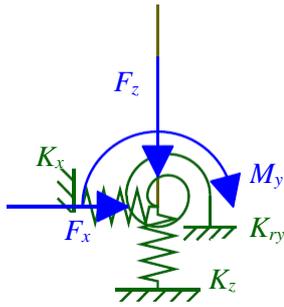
A column connected to a rigid footing represented by foundation springs $[K_f]$ (green) and subjected to equivalent tunnelling forces $\{F\}$ (blue)
